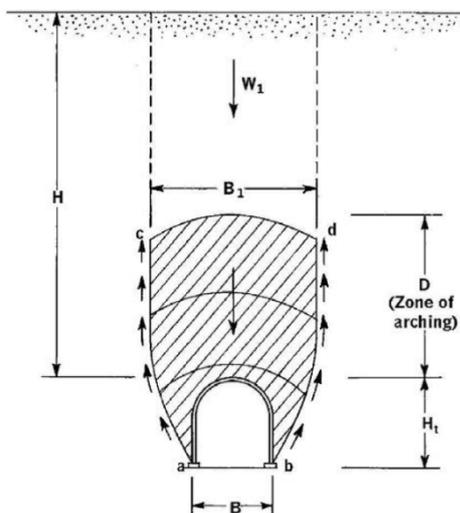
Loading on the tunnel lining (Terzaghi, 1946)
